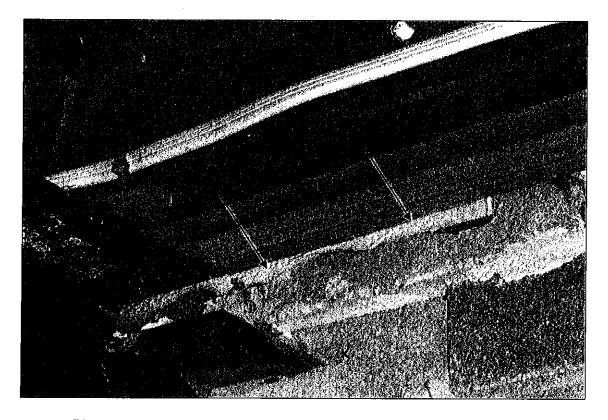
Suspected Asbestos Cement Eave Lining to Building
